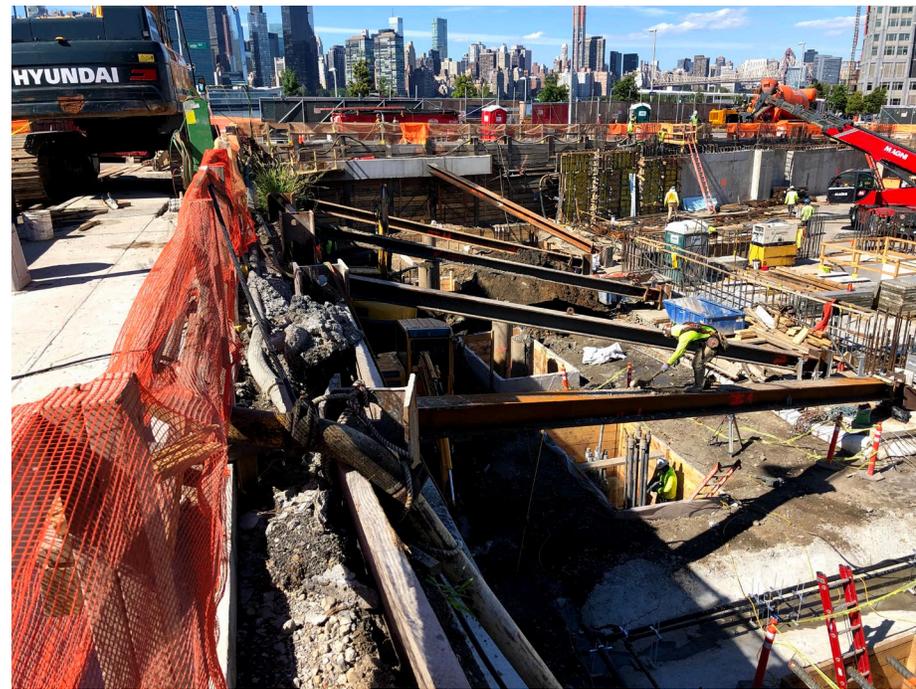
Looking southeast, New Leaf installing waterproofing along the SOE in WCF-A1.
